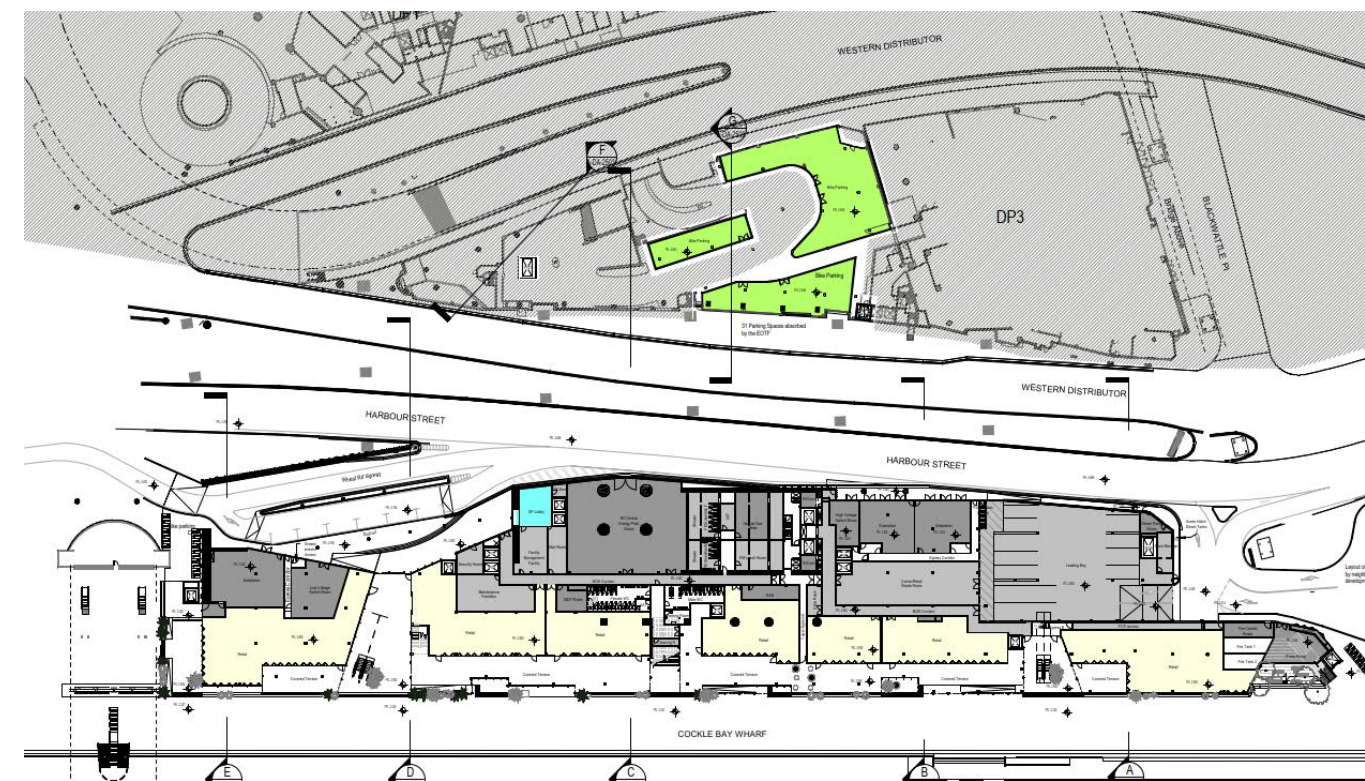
Proposed Ground Floor Plan (Source: Henning Larsen)
